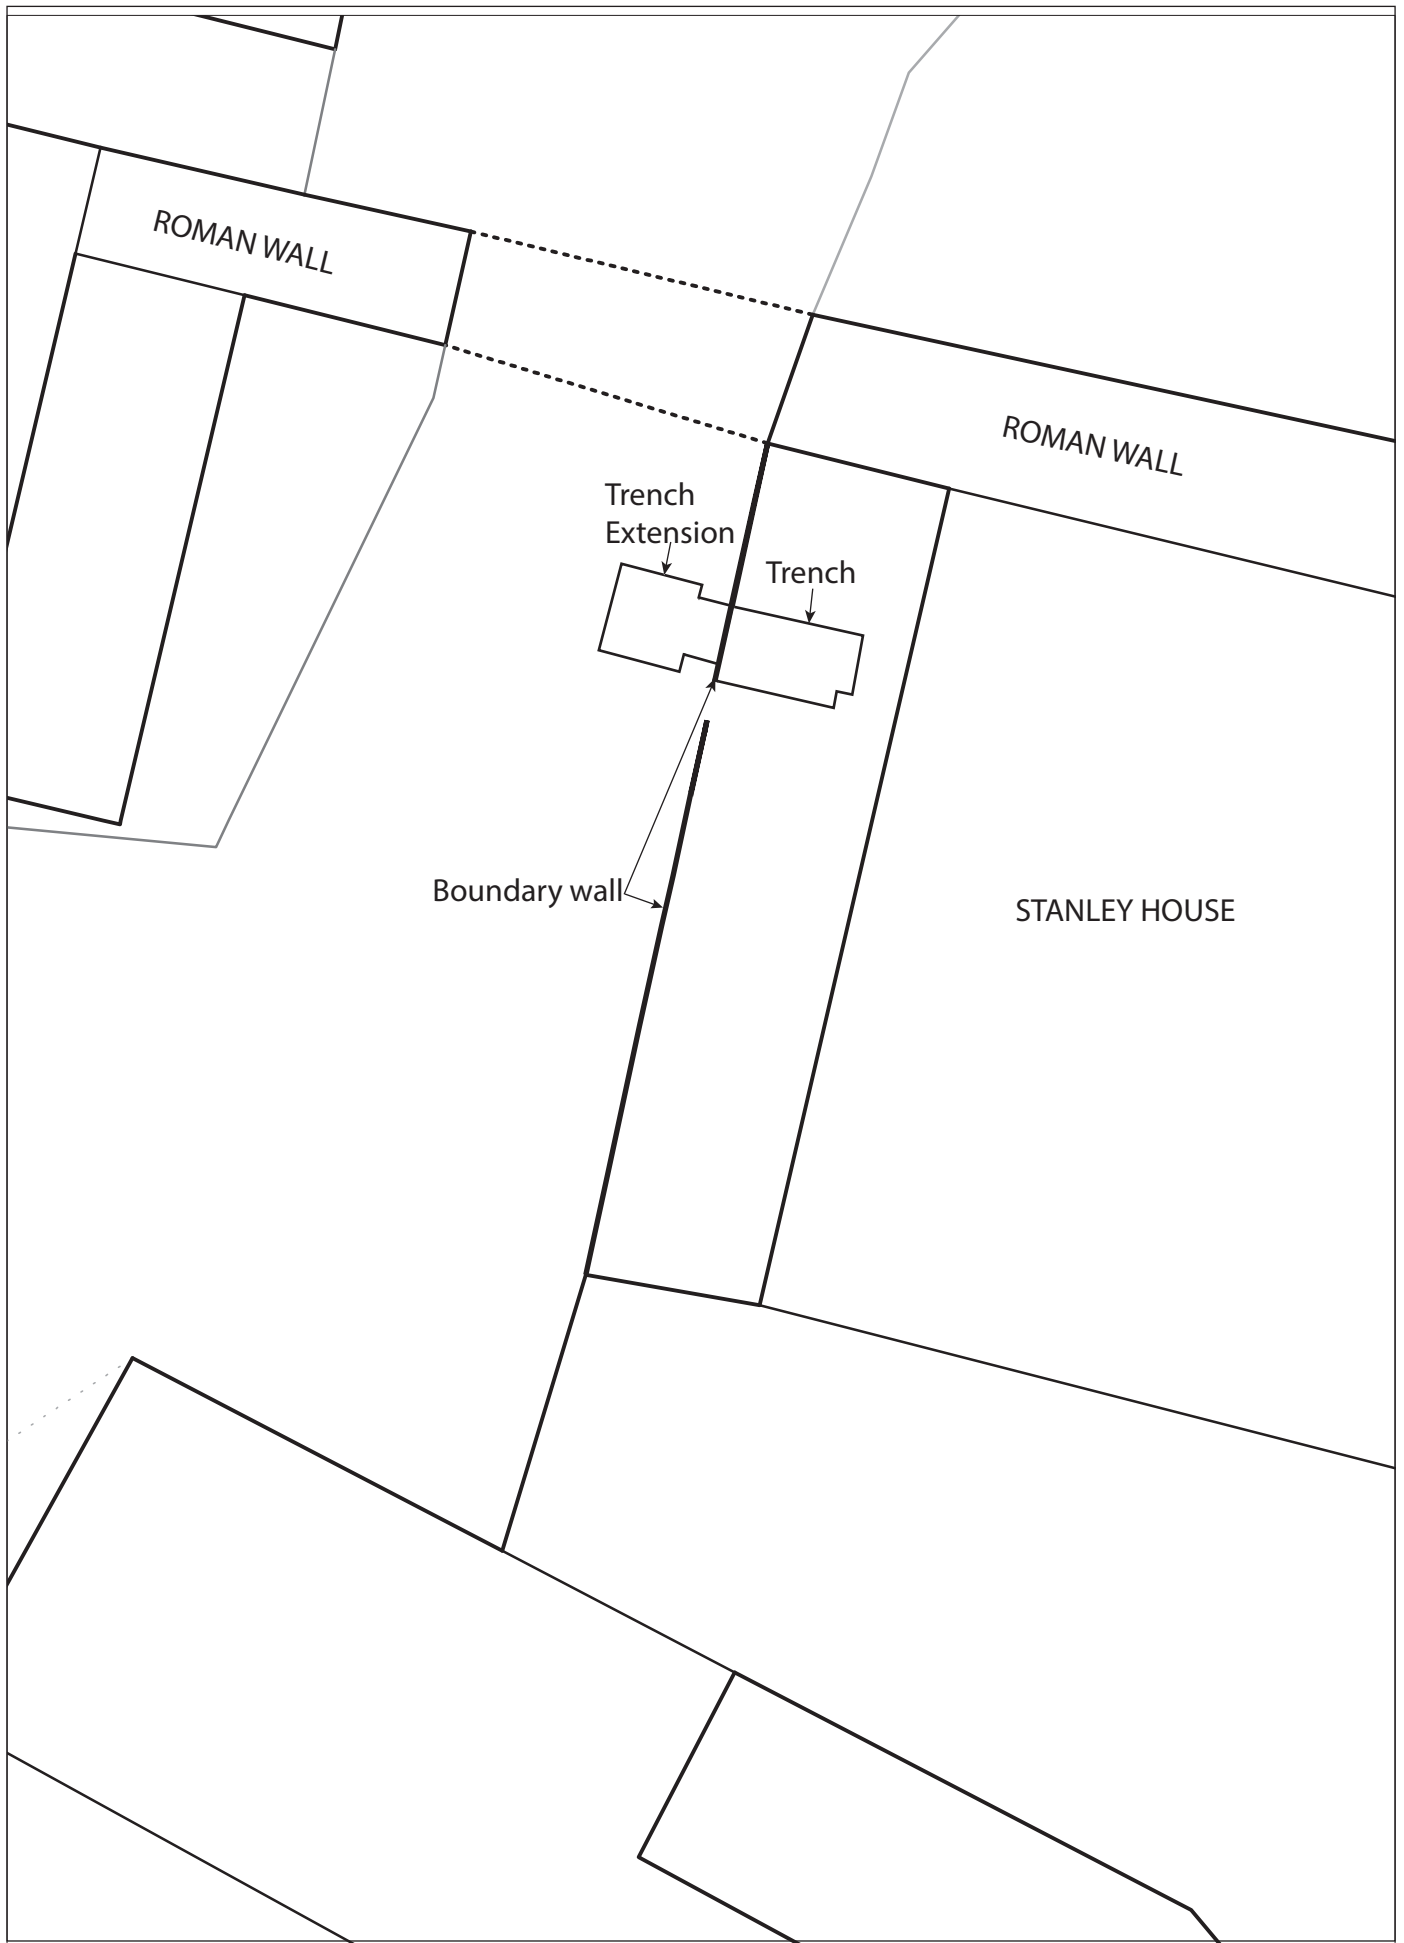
Indicative location plan showing service trenches. Scale 1:100@A4
